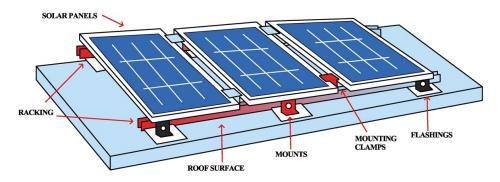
Rooftop solar installation components. (Source: own elaboration).
